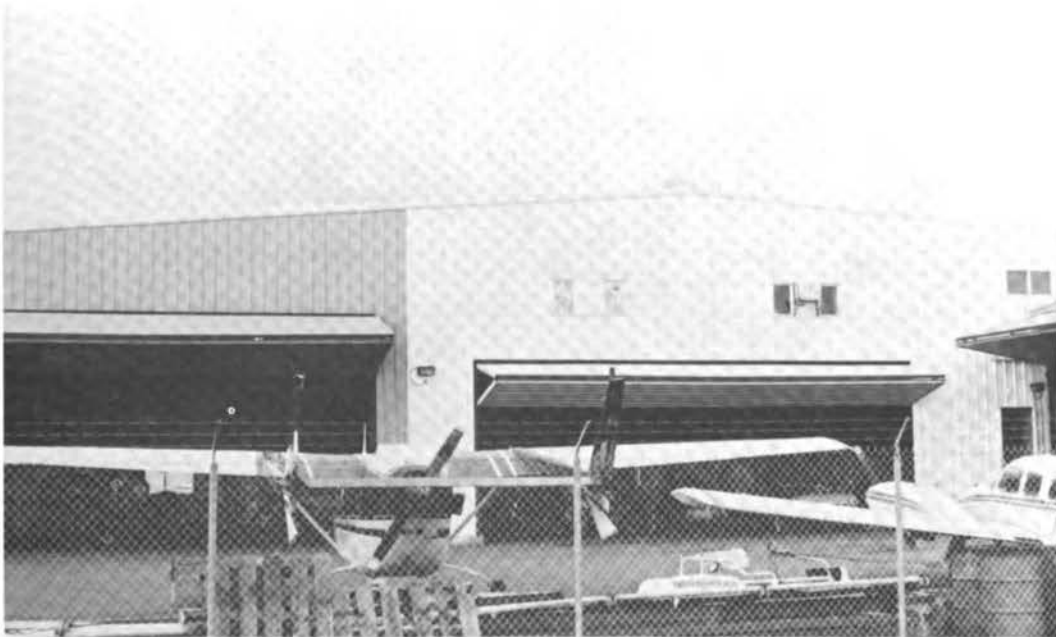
Undamaged preengineered metal hangar building at Honolulu International Airport (note large fold-up doors that escaped damage).
